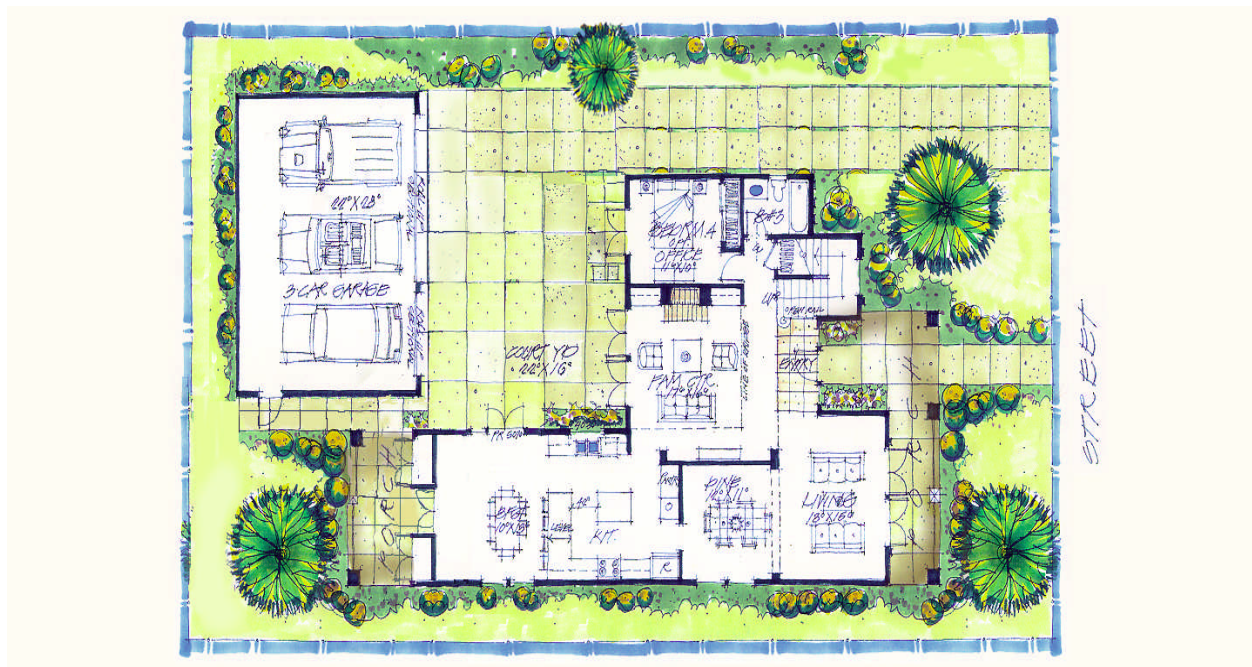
Two Story House Street Access - Rendered plan of ground floor and site conditions
